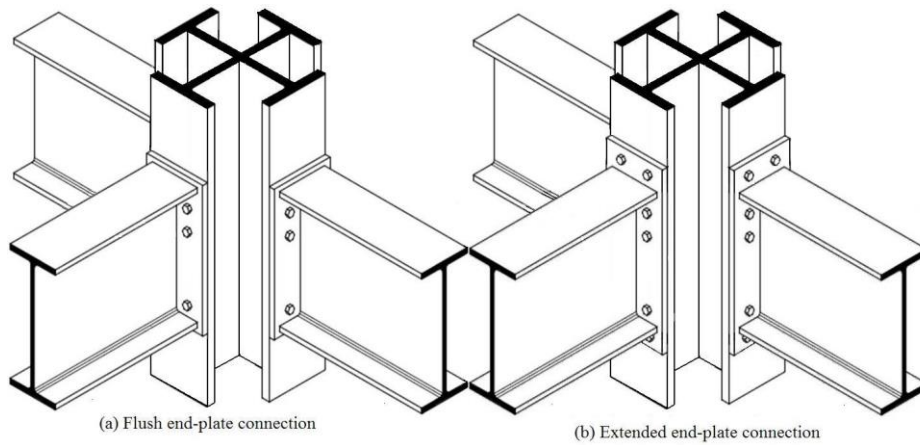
Flush end-plate and extended end-plate connection on cruciform column section [3]
